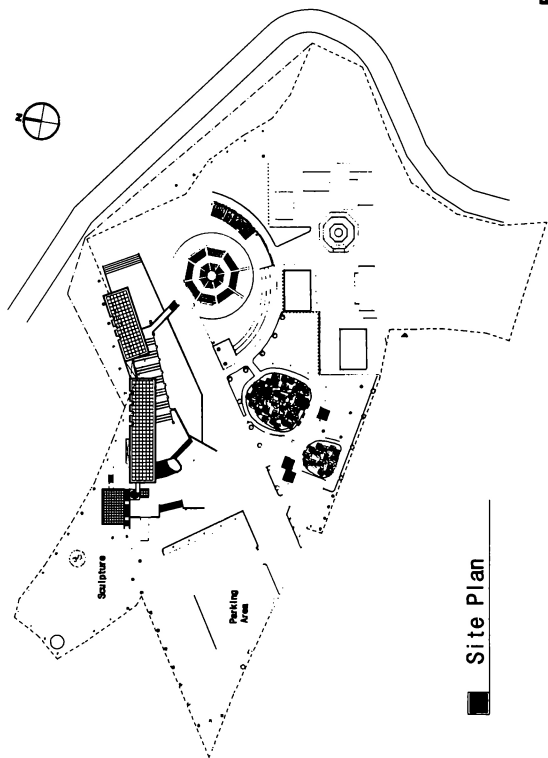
The Site Plan of Changgigott Lighthouse Museum
